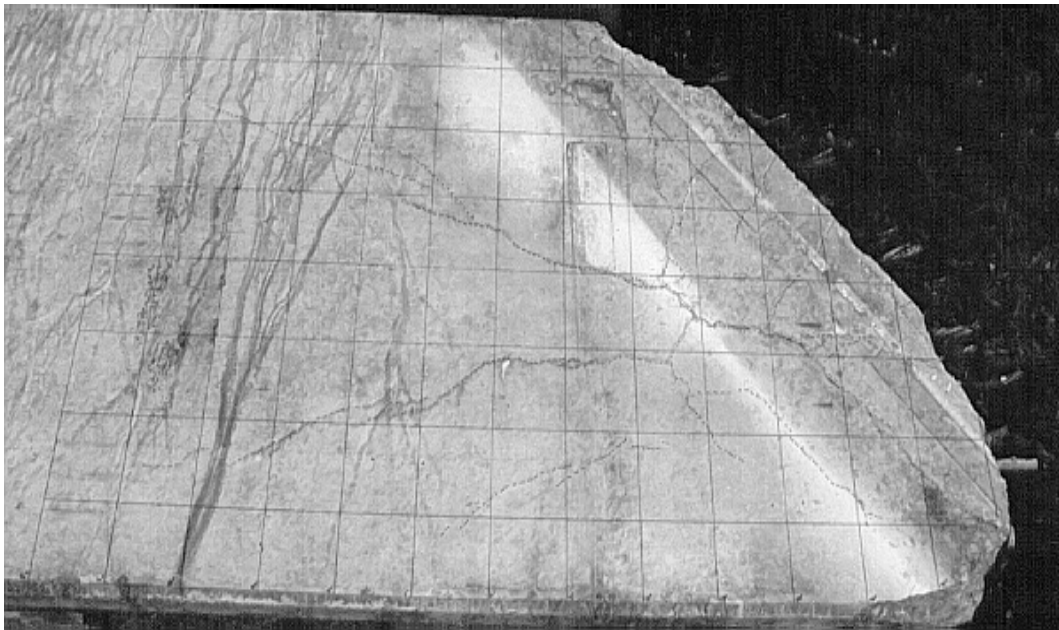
Photograph of Beam Underside, Box Beam 5 - Untested End
